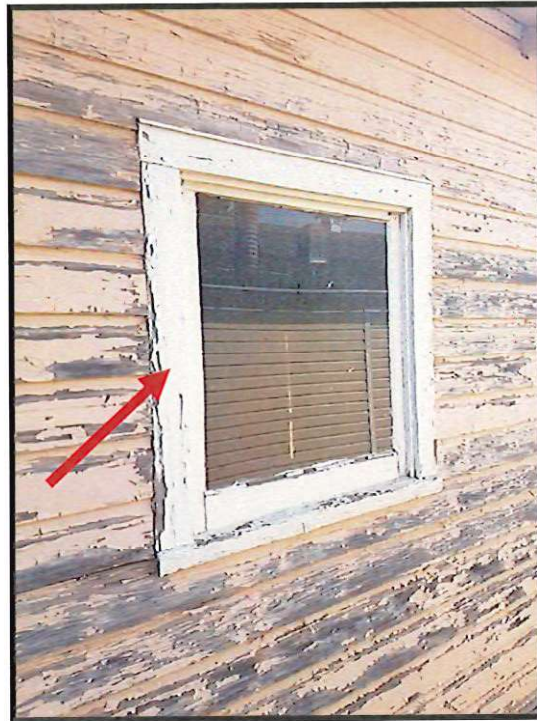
WHITE LEAD-BASED PAINT ON WOOD WINDOW FRAME, WEST SIDE OF GARAGE EXTERIOR
